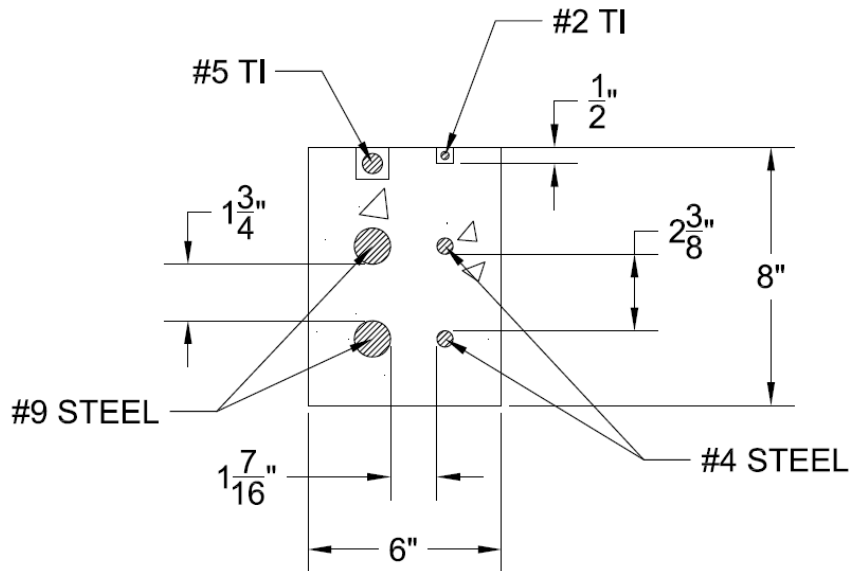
Schematic of small-scale prism specimen cross section (1 in. = 25.4 mm).
